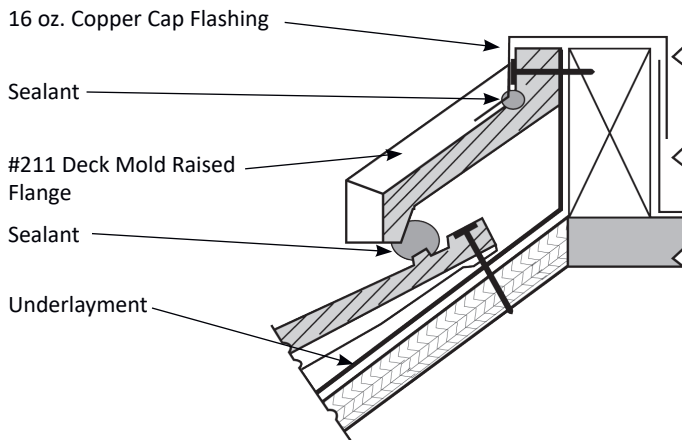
Deck Section with #211 Deck Mold Raised Flange
